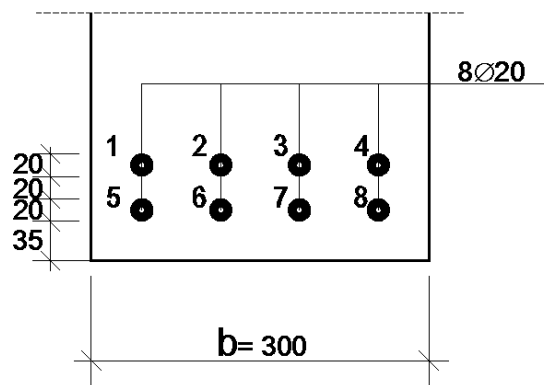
The reinforcement arrangement in the cross-section of the beam. Dimensions used to determine the average distance, a_m .
